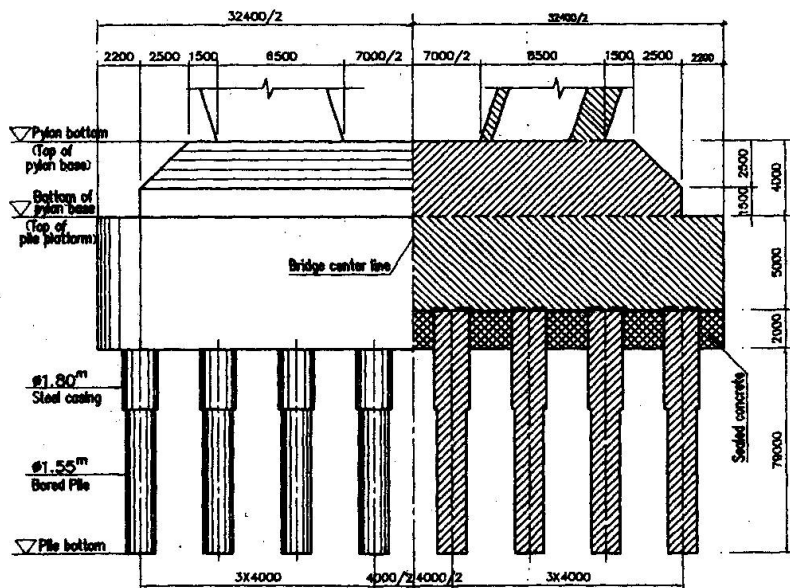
Cast-in-situ bored pile foundation with suspended box cofferdam
